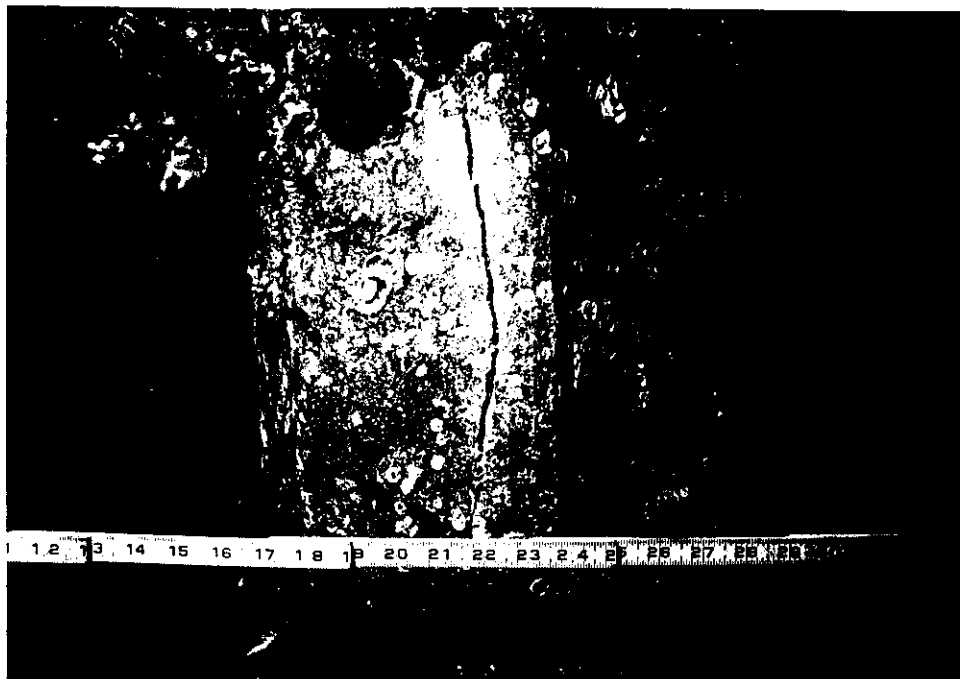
Underwater cracking of a prestressed concrete pile
